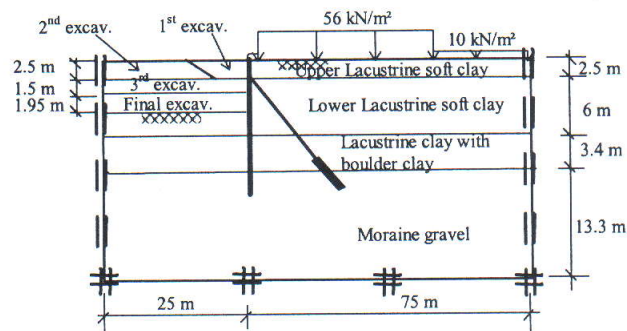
Cross section and soil profile along section b-b in Figure 3.
